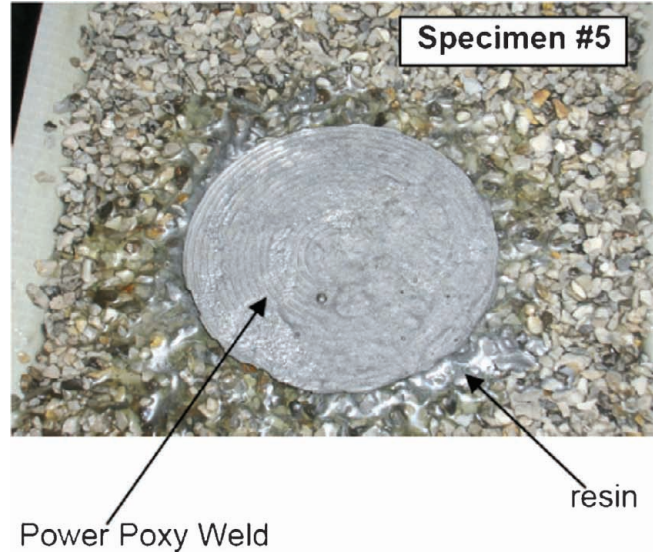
Failure of Steel Disk to Wearing Surface in Test Specimen #5
